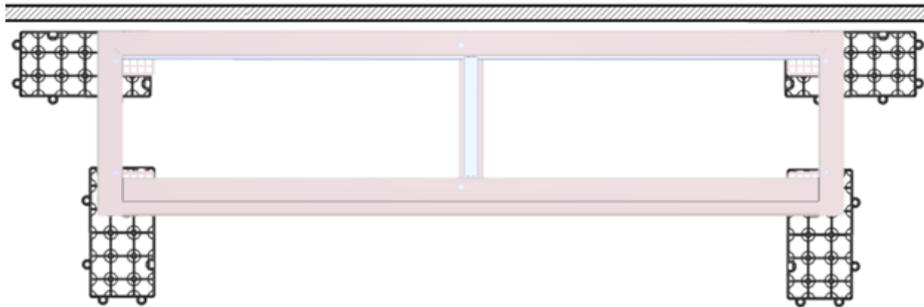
Installation scheme for concrete footings (installation in front of a wall)
